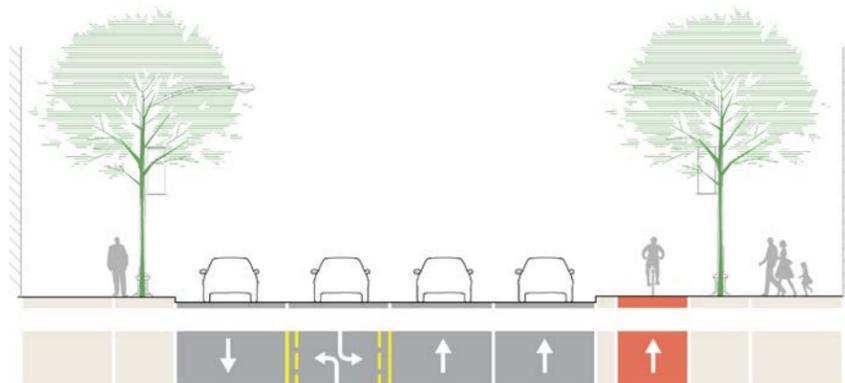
Seventh Street typical section I-35 to San Jacinto Boulevard
